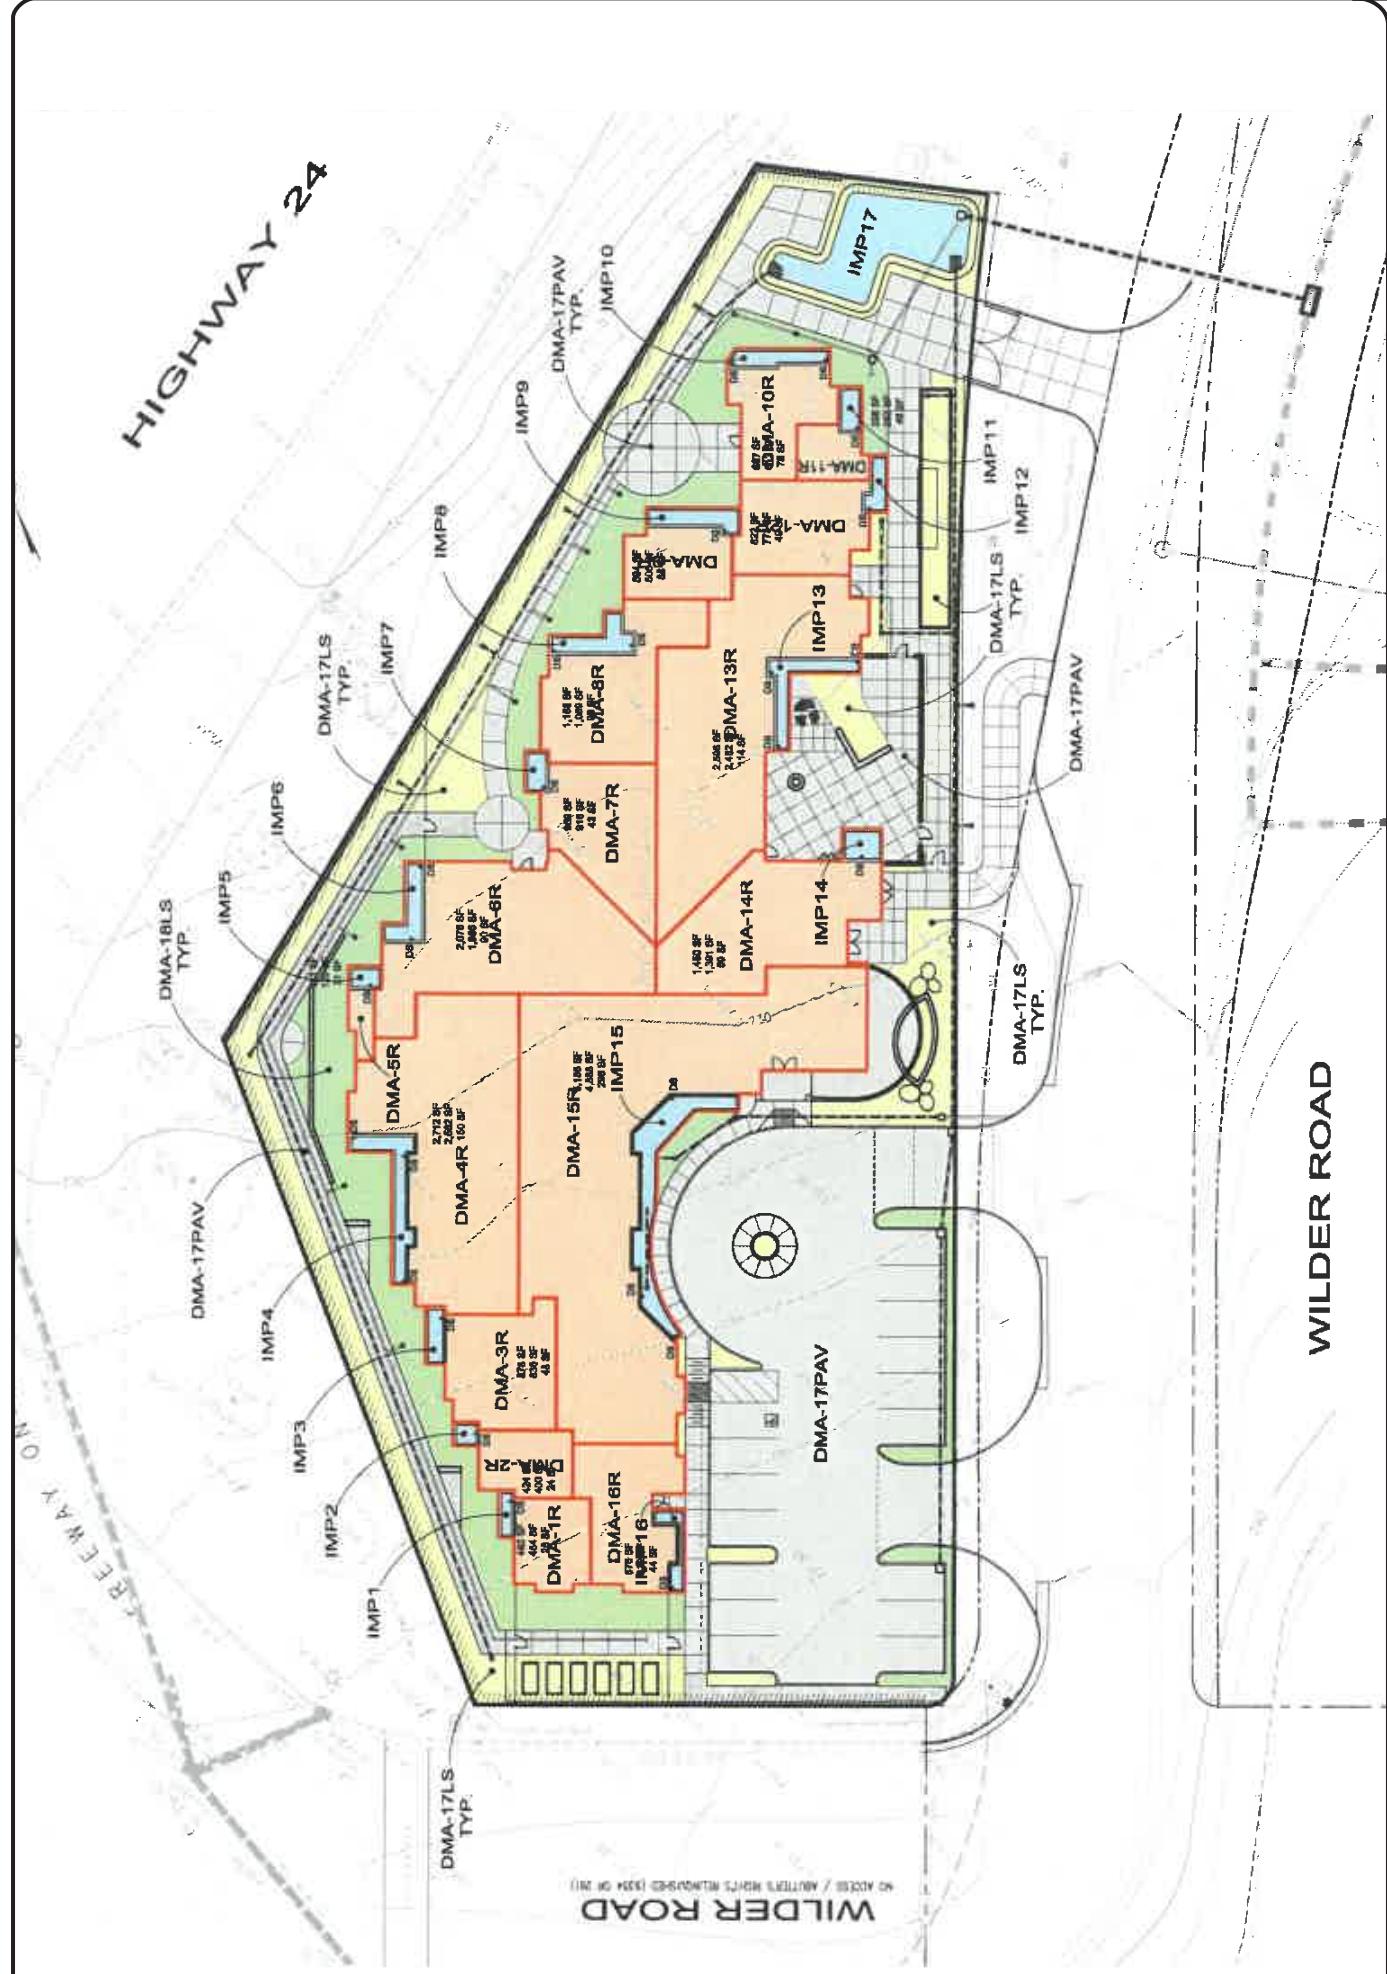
| PROPOSED SITE PLAN PARKING ANALYSIS
